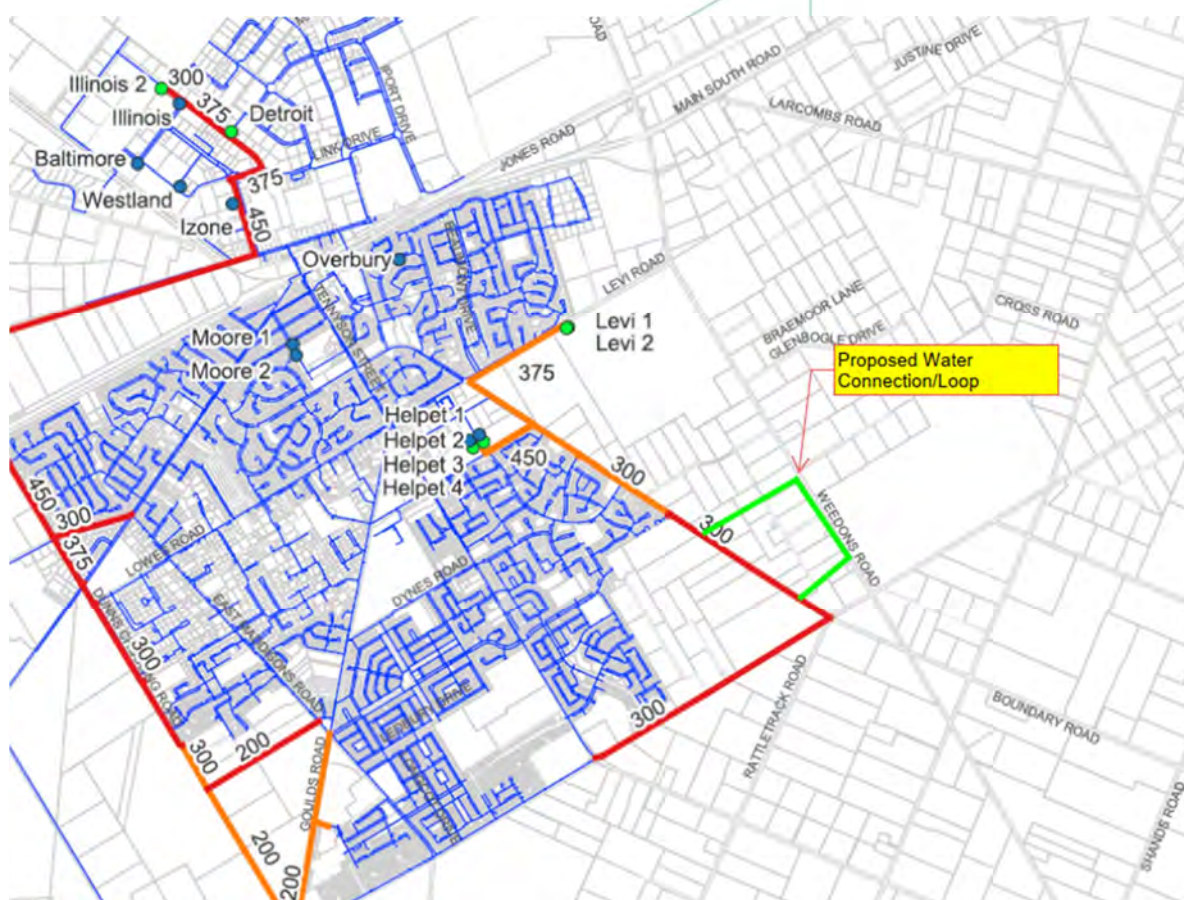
SDC 5 waters plan – with proposed connection for Plan Change area
